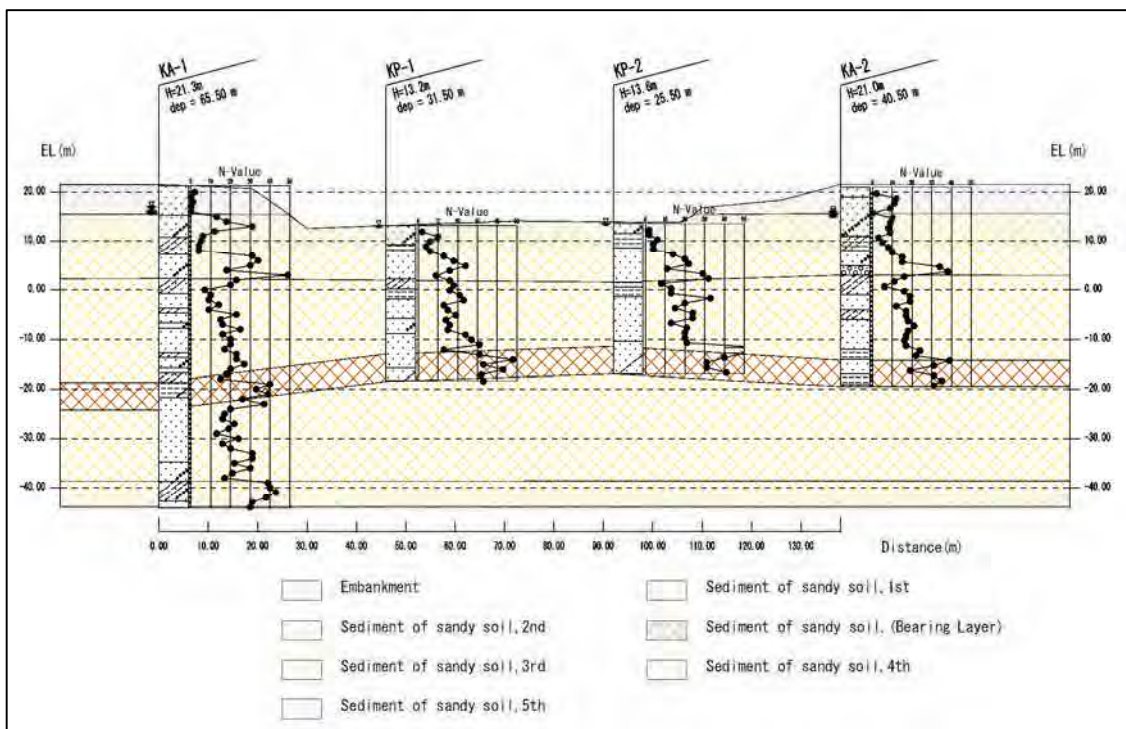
Projected Strata Cross Section - Kapiura Bridge
